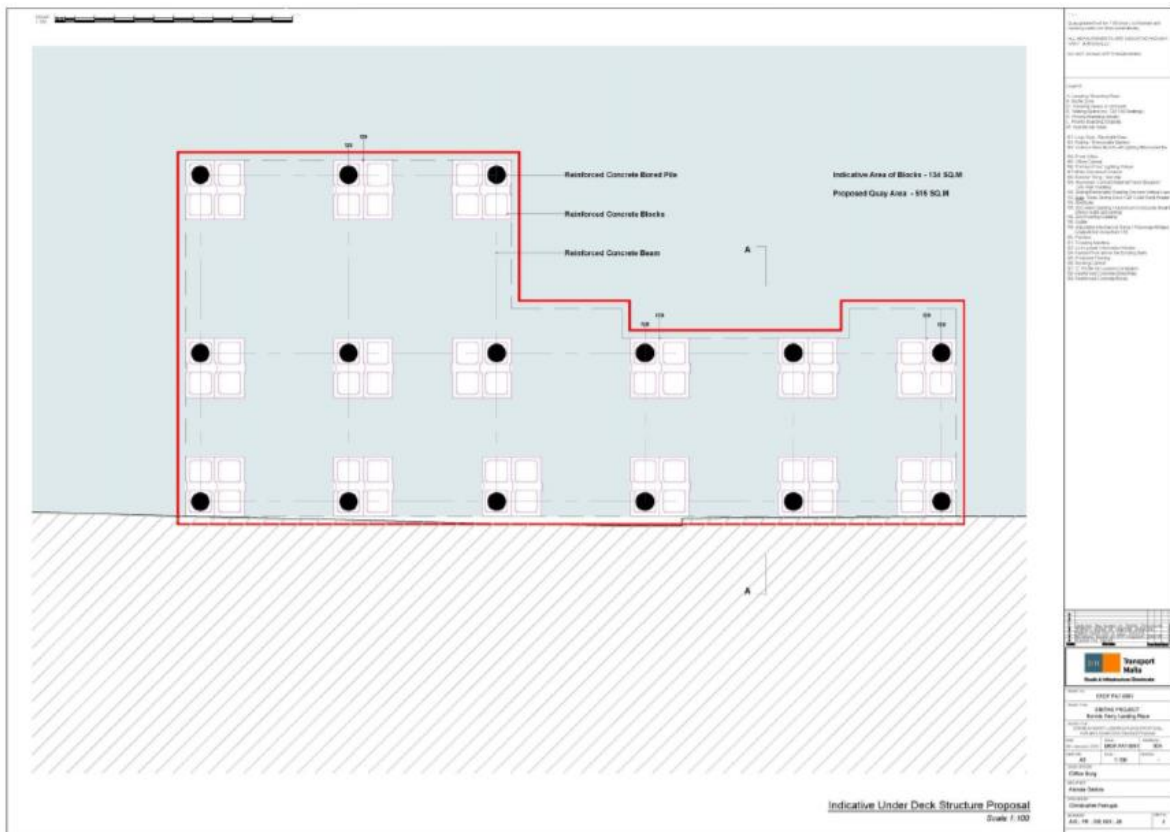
Site plan for the under deck structure of the proposed development (Source: PDS pg 14)
